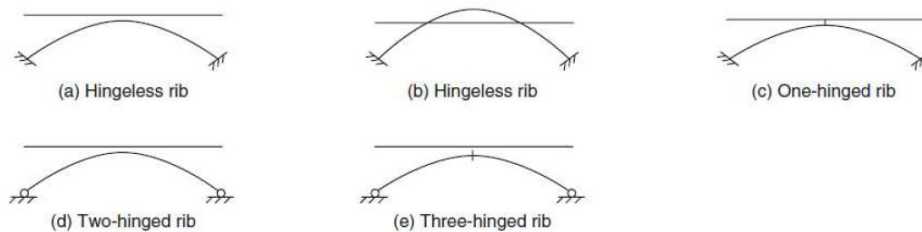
Static Schemes of Arch Bridge Typologies with and without Hinges - (Gens F. , Design and Construction of Bridges - Chapter 03b-1 - Arch Bridges, 2024)
